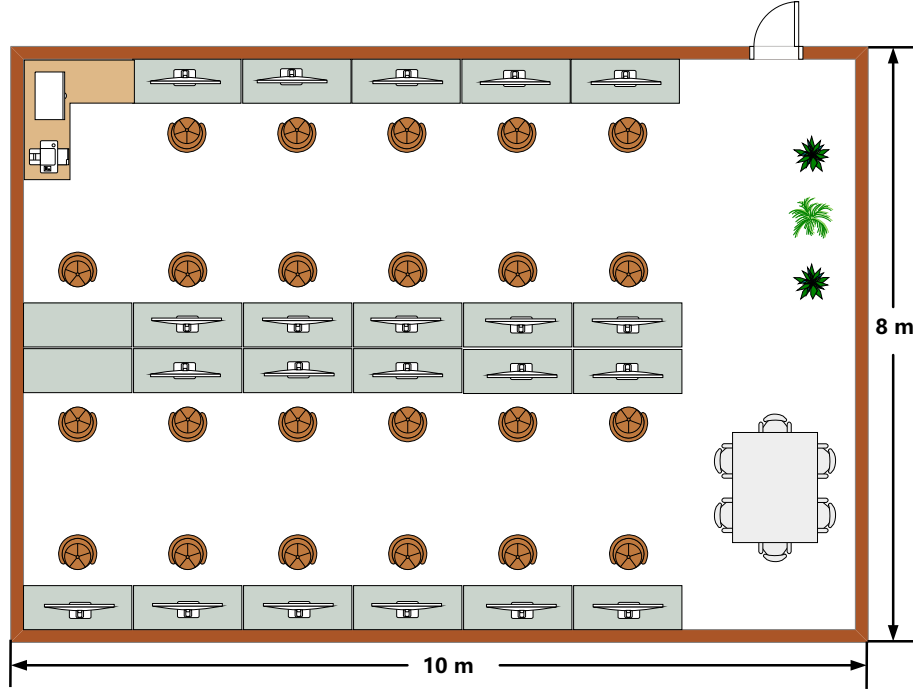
The floor plan of uOttawa SITE 5130 research lab.
